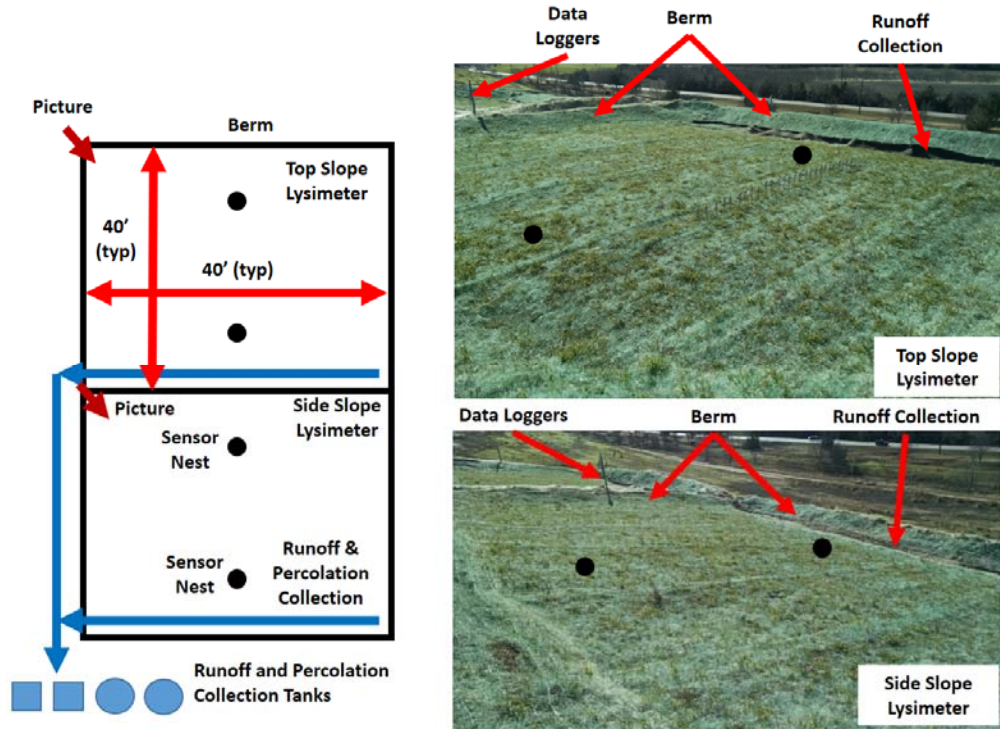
General details of the complete lysimeters and ET cover sections.
